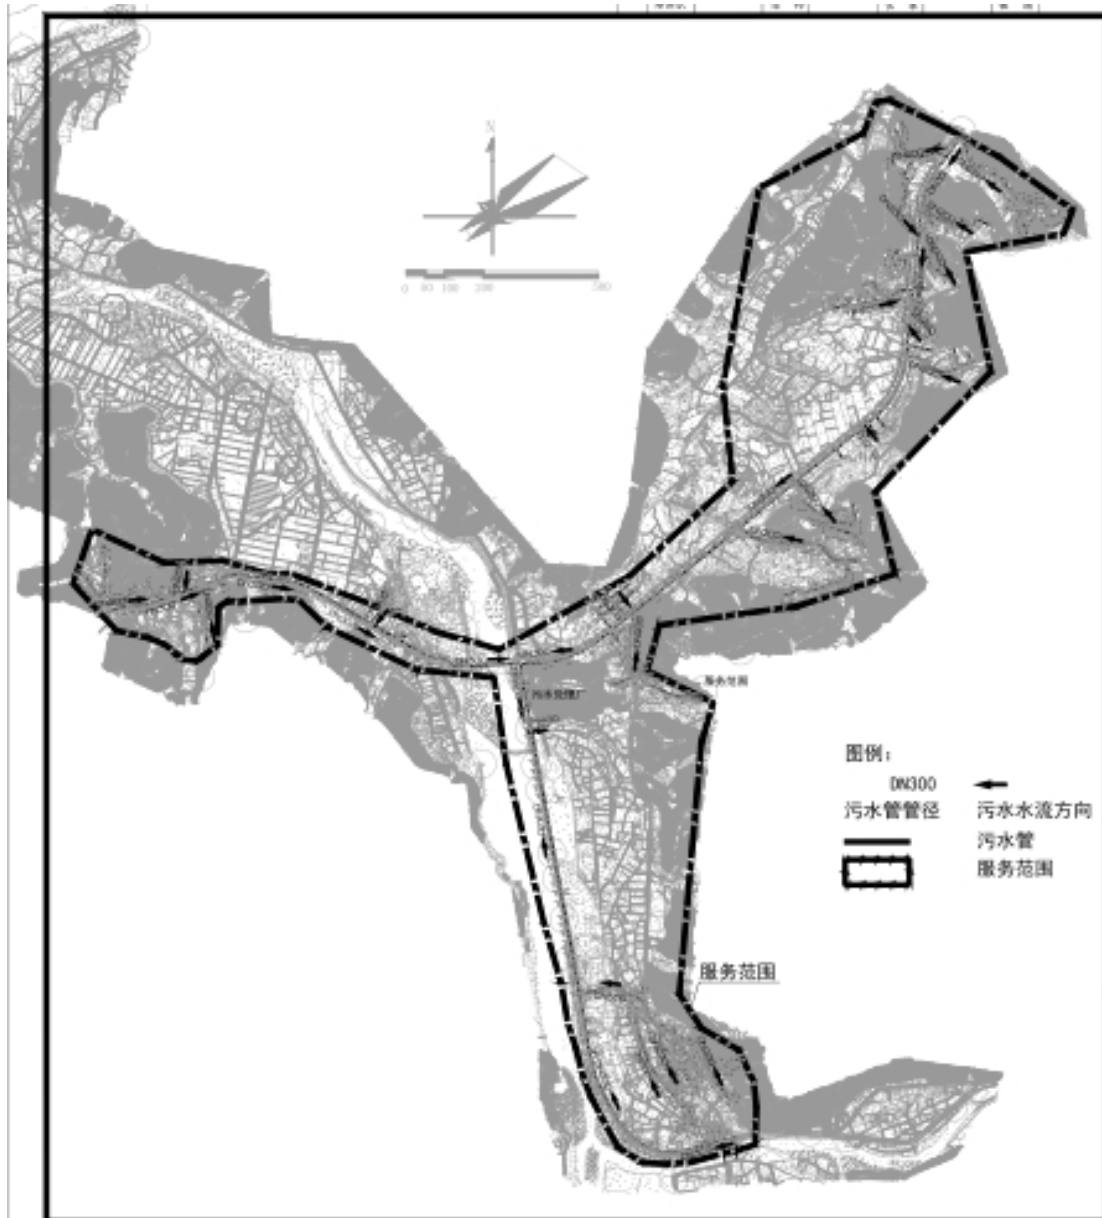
Layout Drawing of Sewage Pipe Network of Lanju Town, Longquan City
